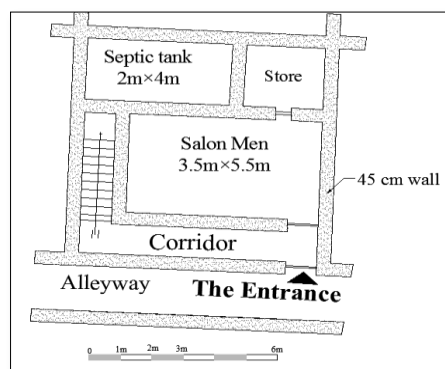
Ground floor plan of Abdulsalam Ali house in Ghadames.
